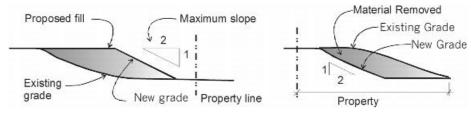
(B): Illustration of fill and cut with maximum slope 2:1.
